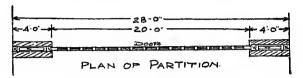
PANELED CEILINGS AND SIDE WALLS
